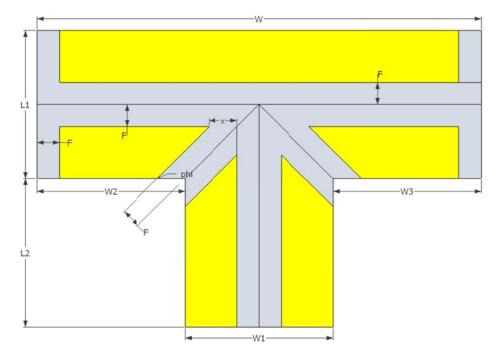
Potential solar zones for a T-shaped building with a gabled roof
